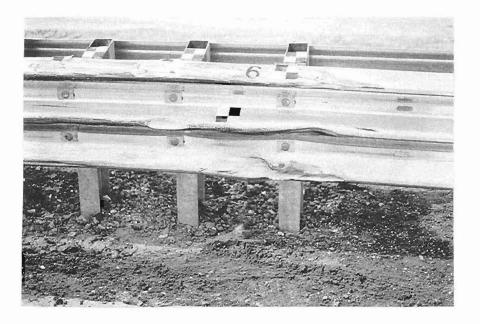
Approach Guardrail Transition Damage, Test MTSS-2
